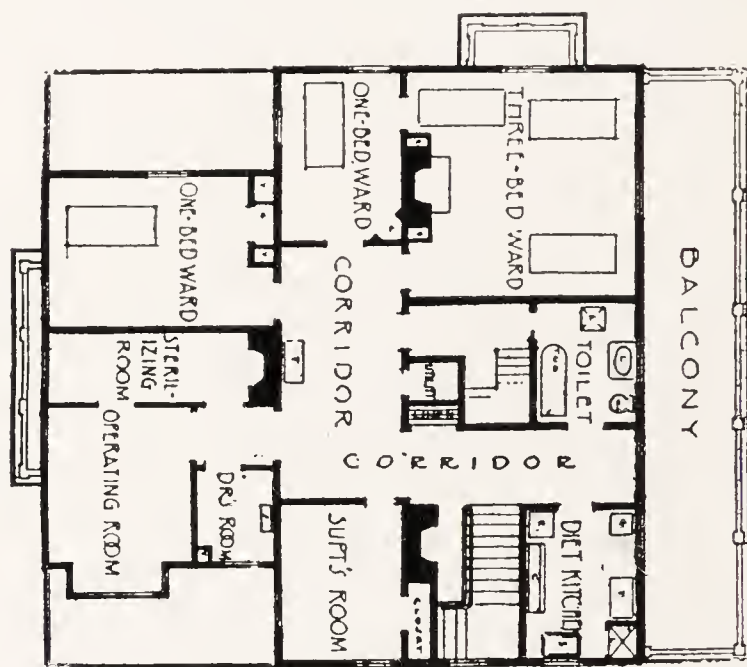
SECOND FLOOR AFTER FIRST REMODELING
